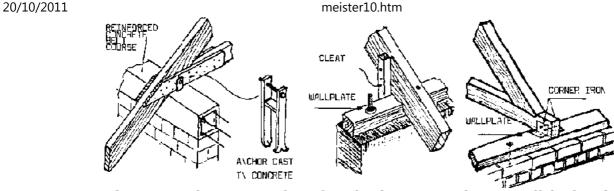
Three examples of anchoring a truss into a wall (ref. 31)
